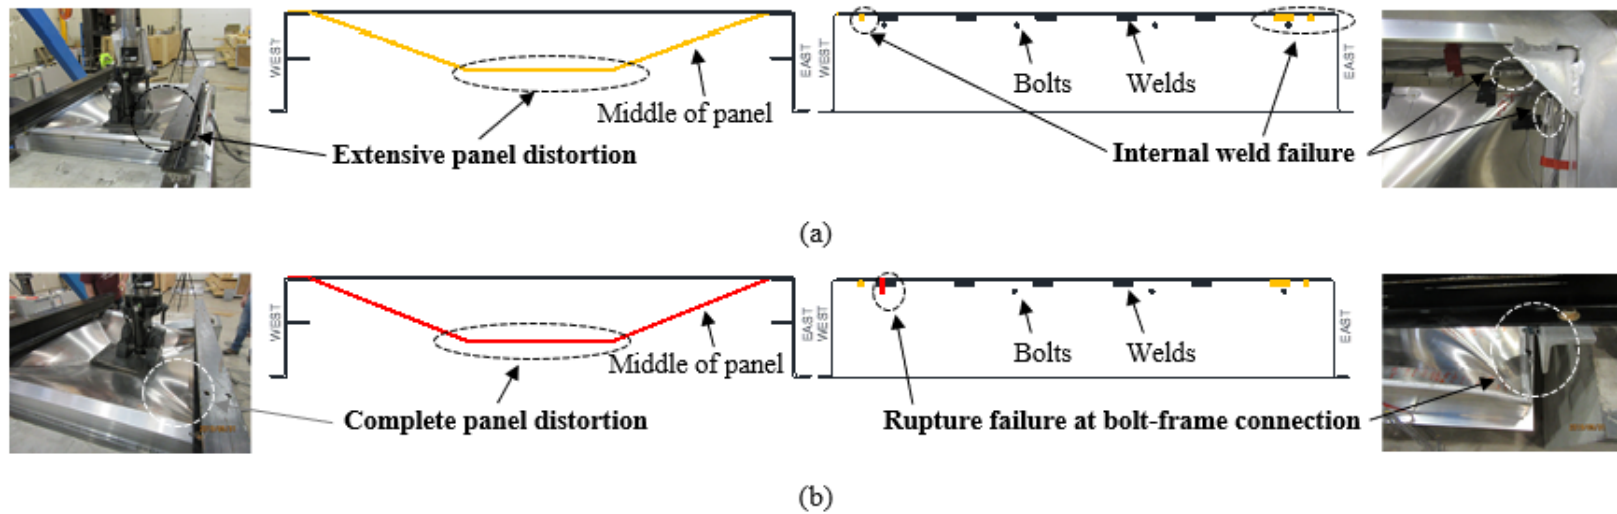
Elevation view of failure modes in welded DMS: (a) weld failure and (b) rupture failure.
